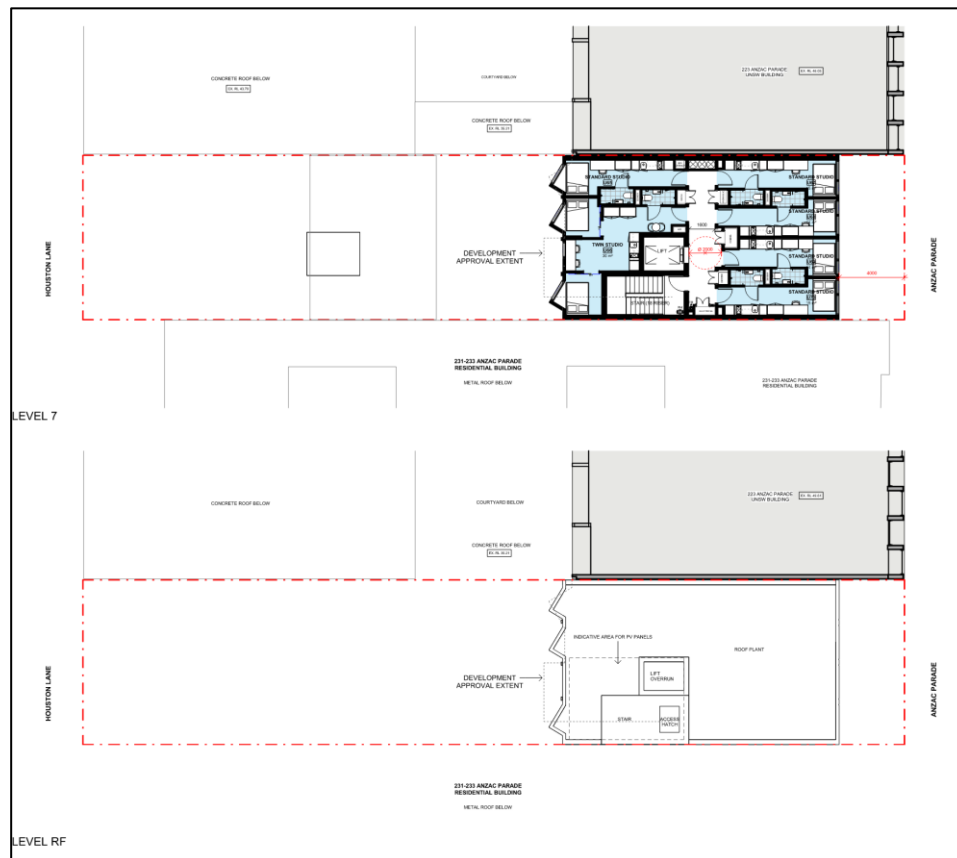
Floor Plans for levels 7 and 8 (Source: Applicant)
